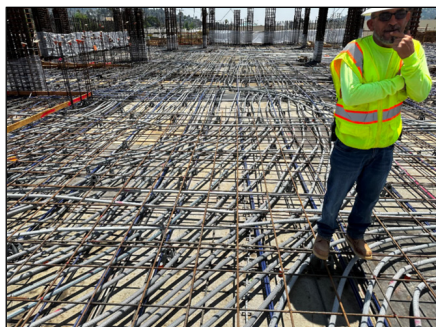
A second example of the congestion of conduits in a slab. The curvilinear silver elements are conduits, the blue elements are post-tensioning cables, and the brown elements are mild steel reinforcing bars. Photo taken after the top side reinforcement was placed to moderate the conduit impact after observation of installation
